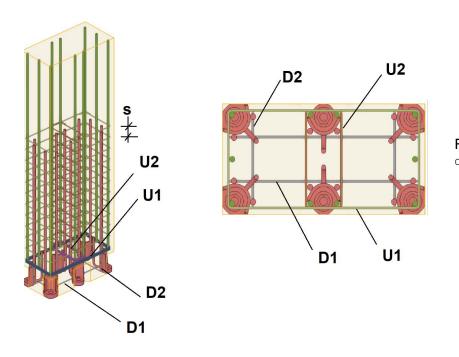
Column shoes and reinforcement overlap for layout with intermediate shoes
